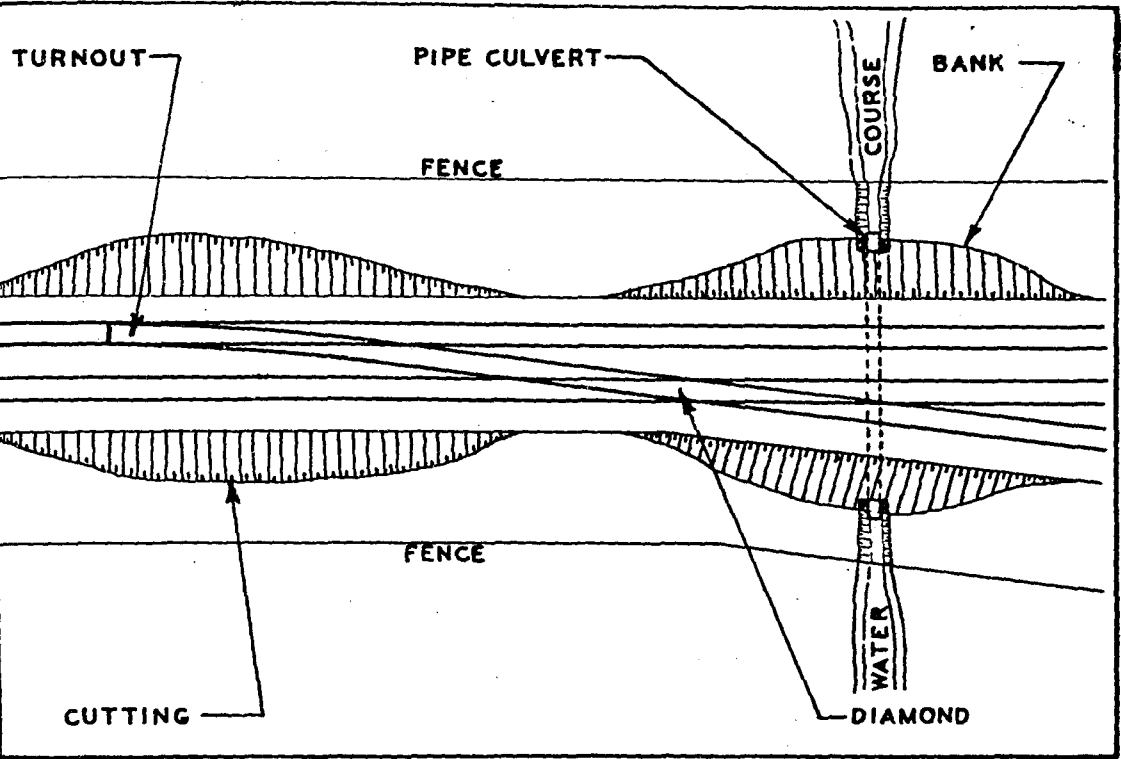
PLAN SHOWING WORK TO BE CARRIED OUT
